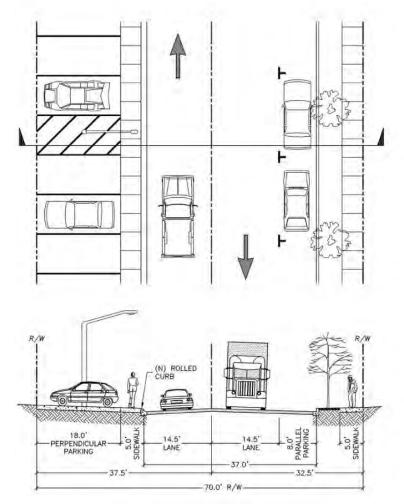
Potential 18th Street 70' Plan/Cross-Section with Perpendicular Parking
